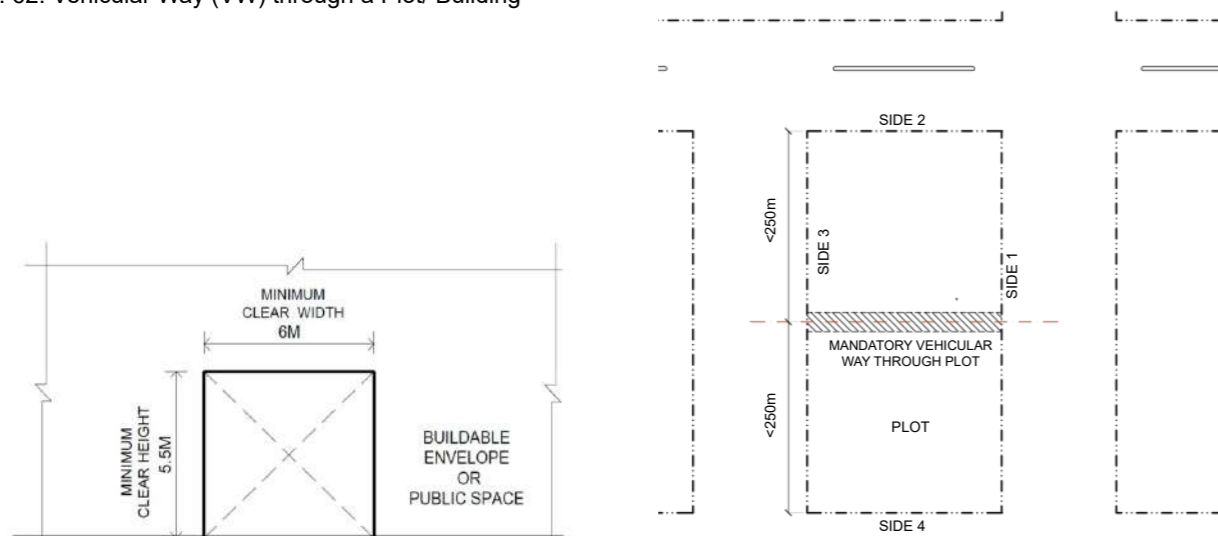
Typical cross-section of a VW through a Plot/ Building
